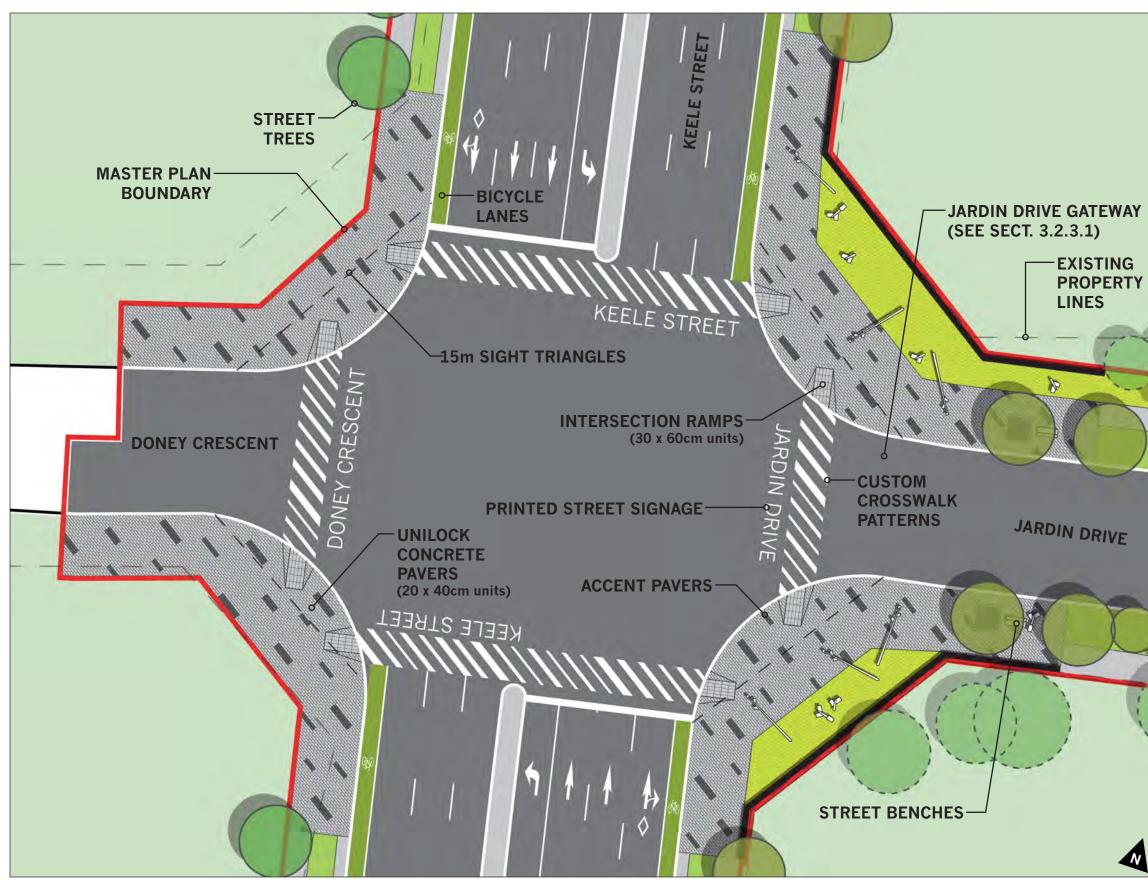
Keele Street & Jardin Drive Intersection streetscape concept.
